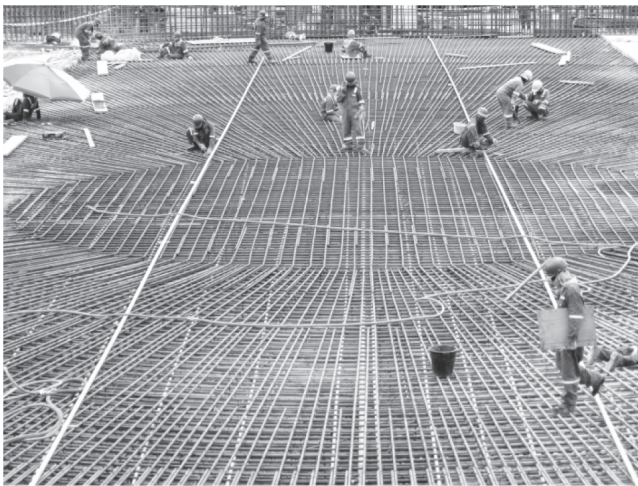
Orthogonal reinforcement layout in middle of base slab.
